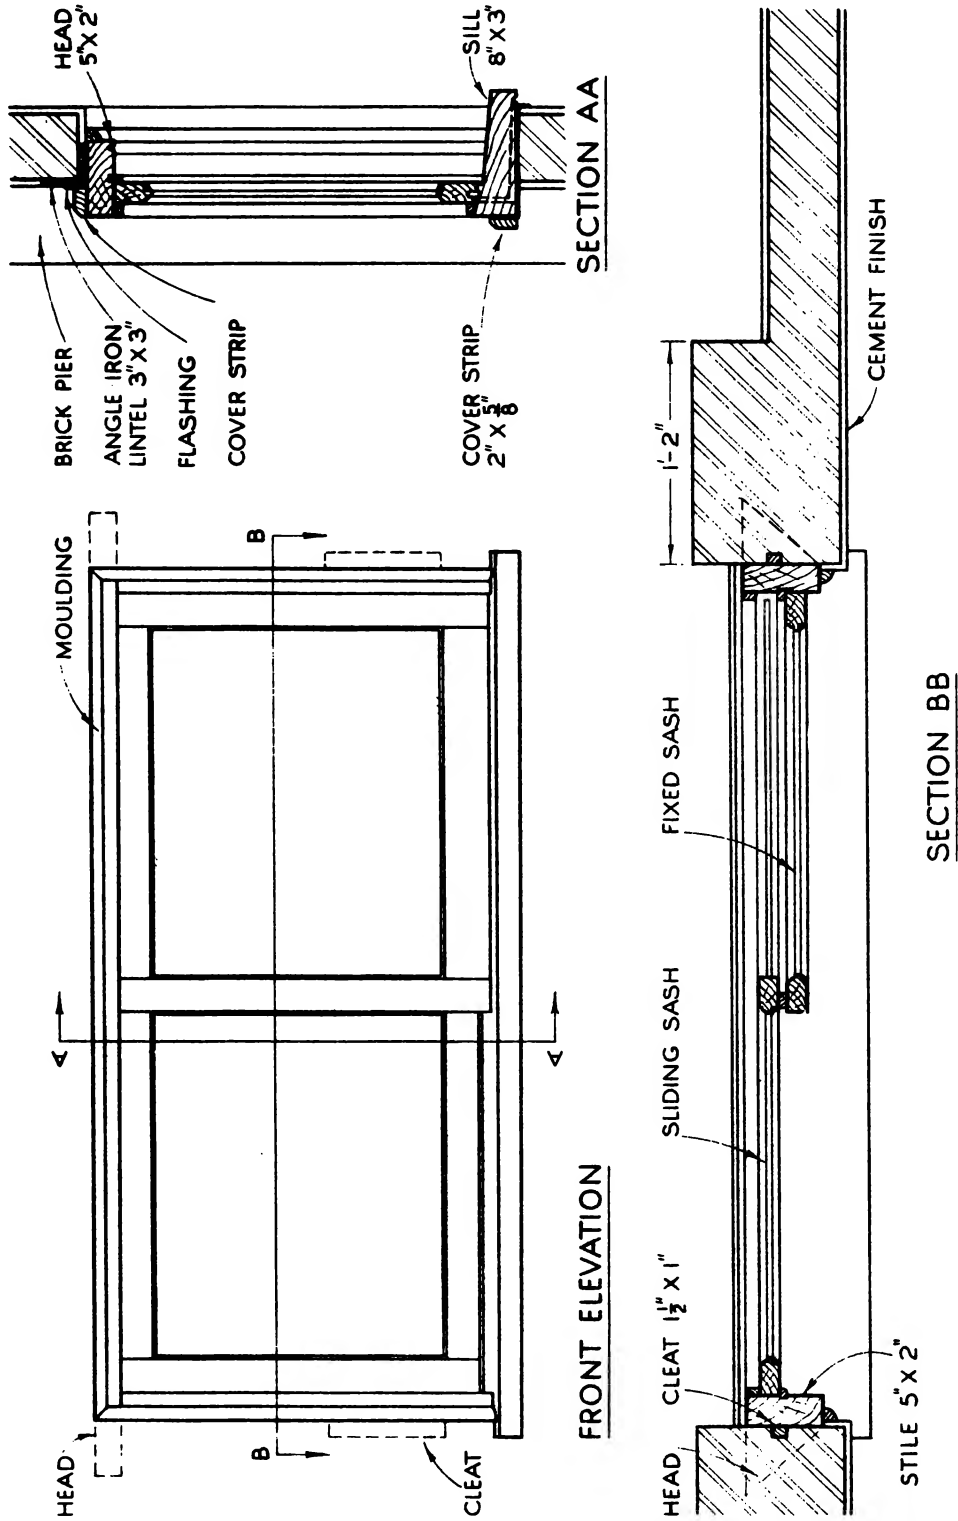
Front Elevation and Sections of Window Frame and Sashes.
